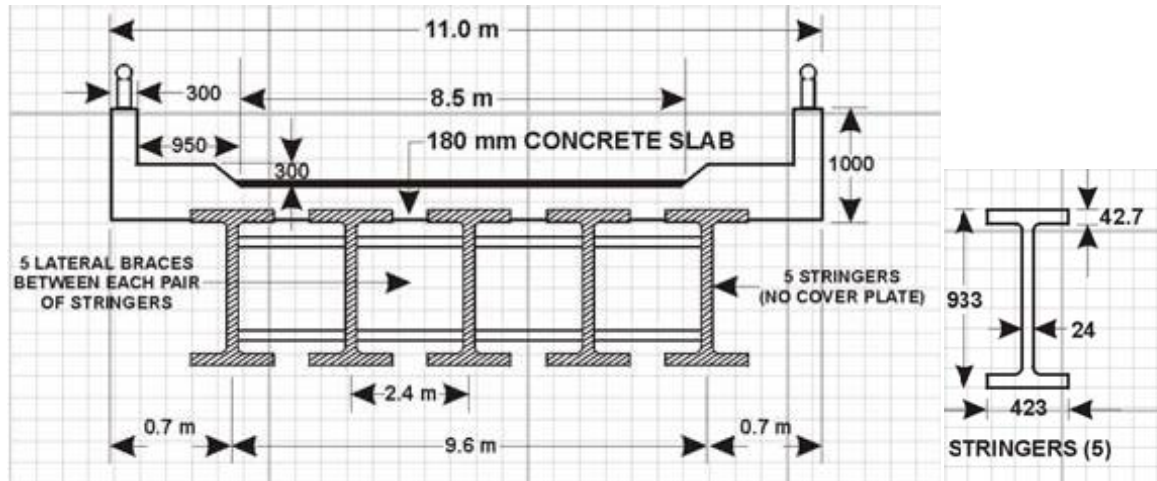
Cross Section of Bridge (DND, 2007a), 21.95 m steel-stringer (x5)
